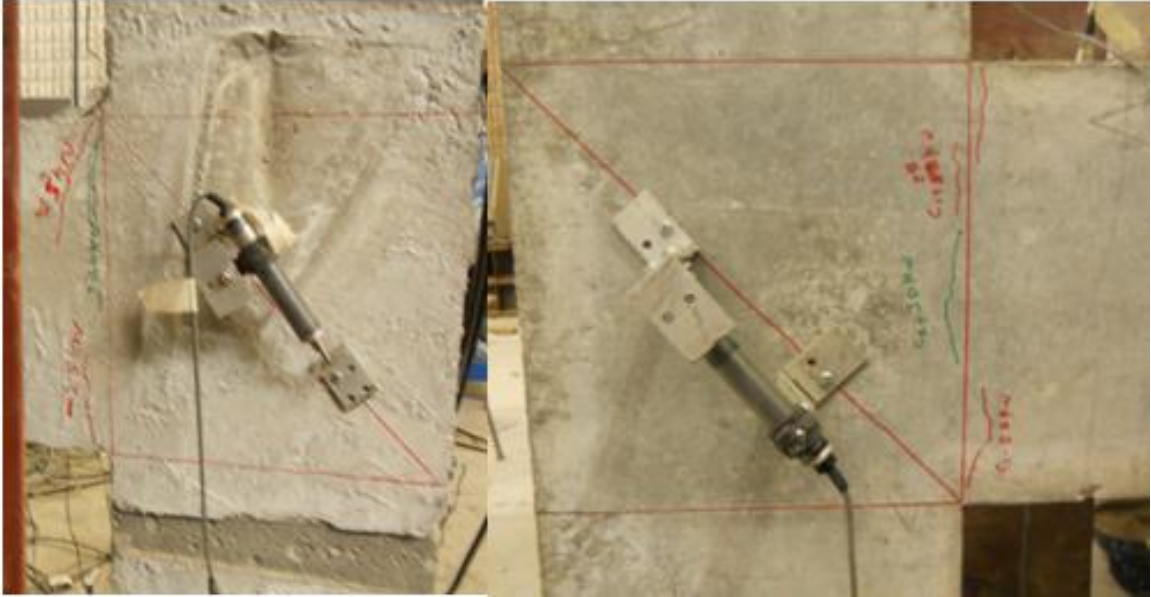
Position of LVDT's in joint to observe diagonal cracks
